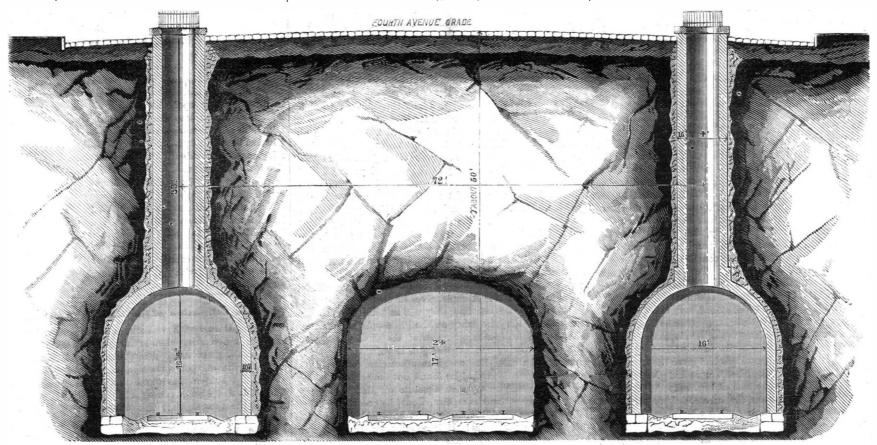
THE UNDERGROUND RAILWAY IN NEW YORK.—THE ROCK TUNNELS, FOURTH AVENUE, BETWEEN 92d AND 94th STREETS!
